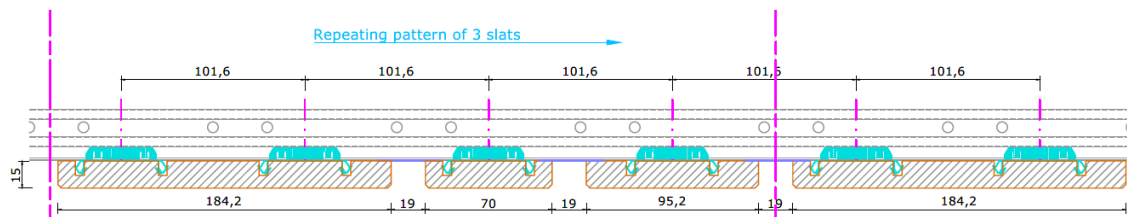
Bamboo Ceiling Cross-Section (Derako, 2019)
